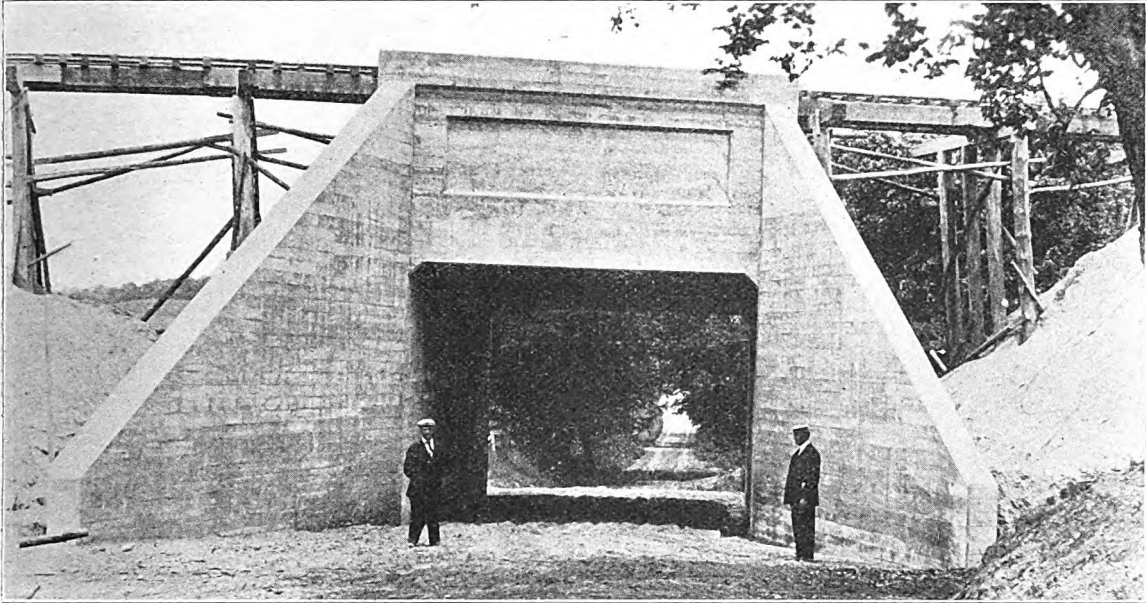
Under Crossing, 20x16 ft., Near Cambridge.
